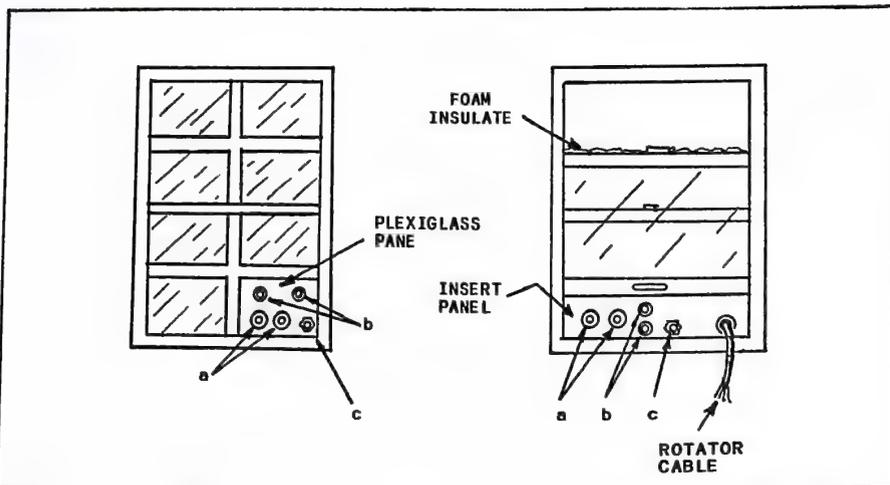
Examples of window panels that may be used to bring cables and wires into a house from out of doors. The types and numbers of feed-through fittings are a matter of personal choice. In these examples "a" is a ceramic feedthrough bushing for balanced feeders. Item "b" is a coaxial feedthrough connector, type PL-258. A bolt is used for the through ground terminal ("c"). In the right-hand example the lower half of the window is raised to allow the insert panel to be held in place by the weight of the window. Foam insulation is packed between the window panes near the top. This prevents insects and cold air from entering the house at the window offset point. A rubber grommet can be used at the point where a rotator cable passes through the panel.
